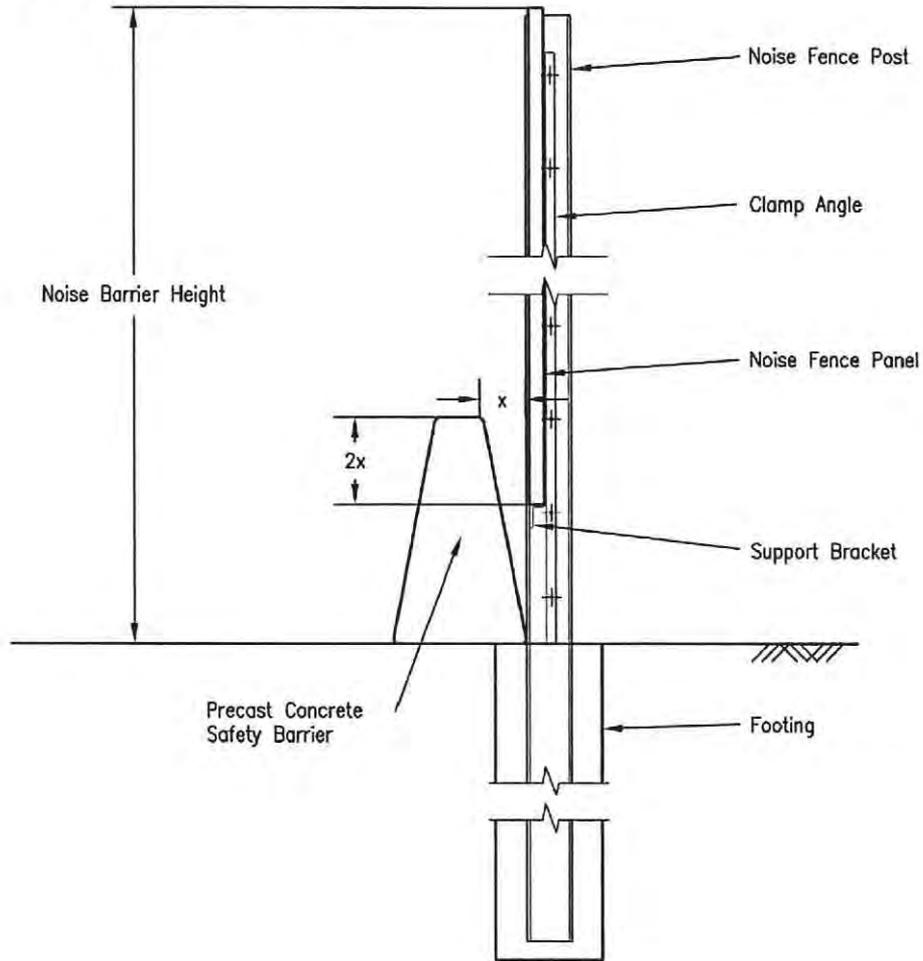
(a) Option A – Precast Concrete Safety Barrier
